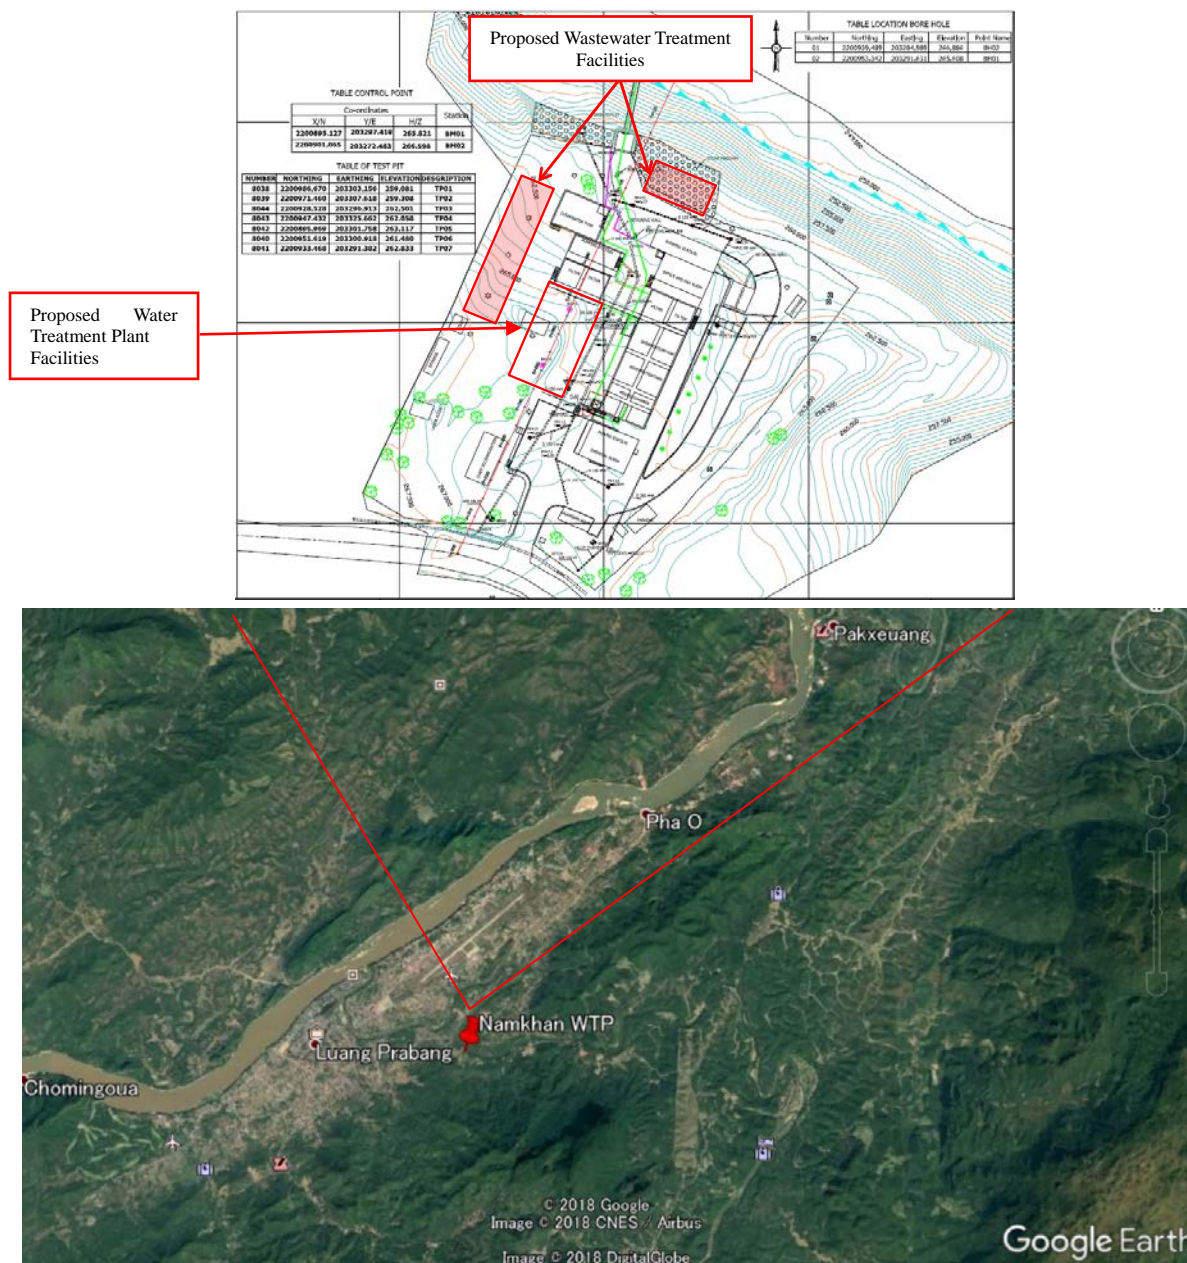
Namkhan WTP and new facilities to be constructed
